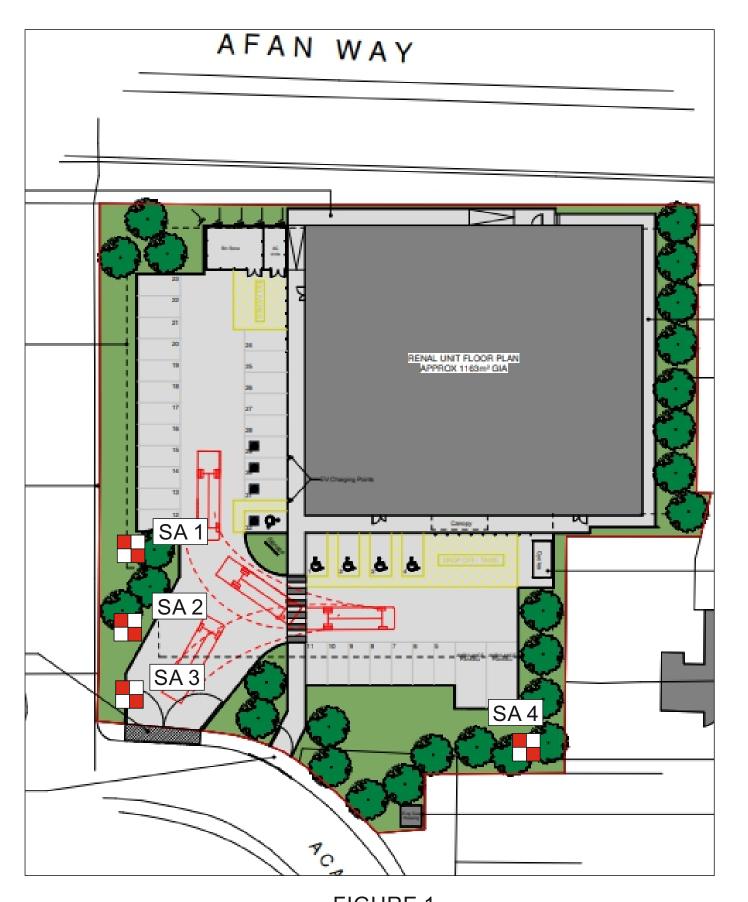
SOAKAWAY TRIAL PIT LOCATIONS ON PROPOSED BUILDING LAYOUT.
